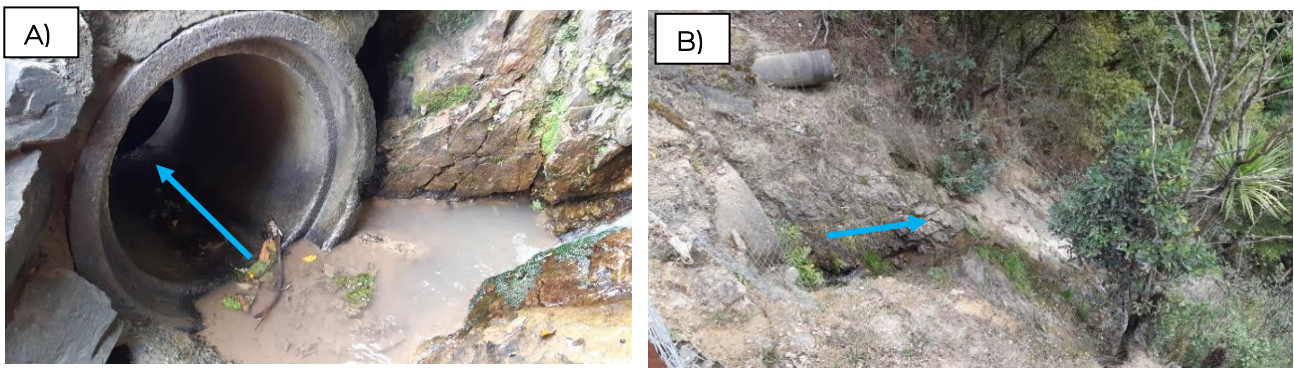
Site D2: A) Waterfall: current inlet to be replaced, B) outlet.
